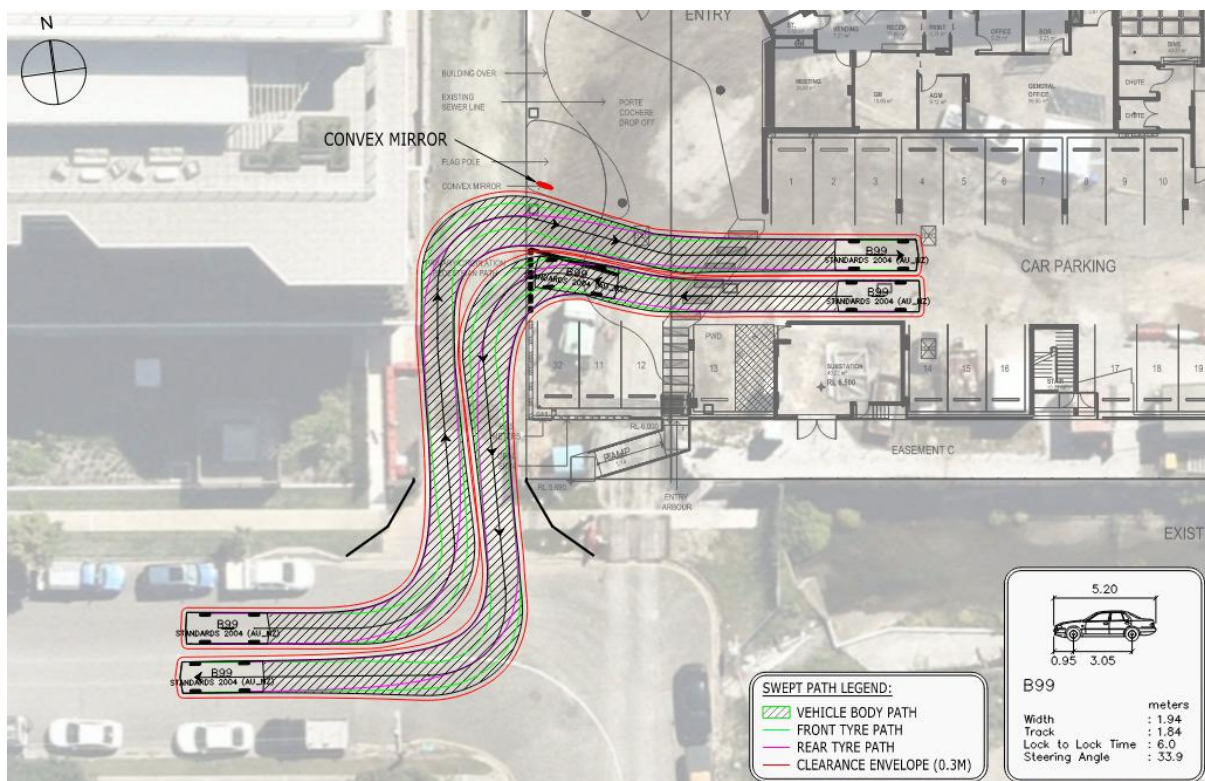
B99 Swept path access and egress adjoining new substation (Source: PTT)
